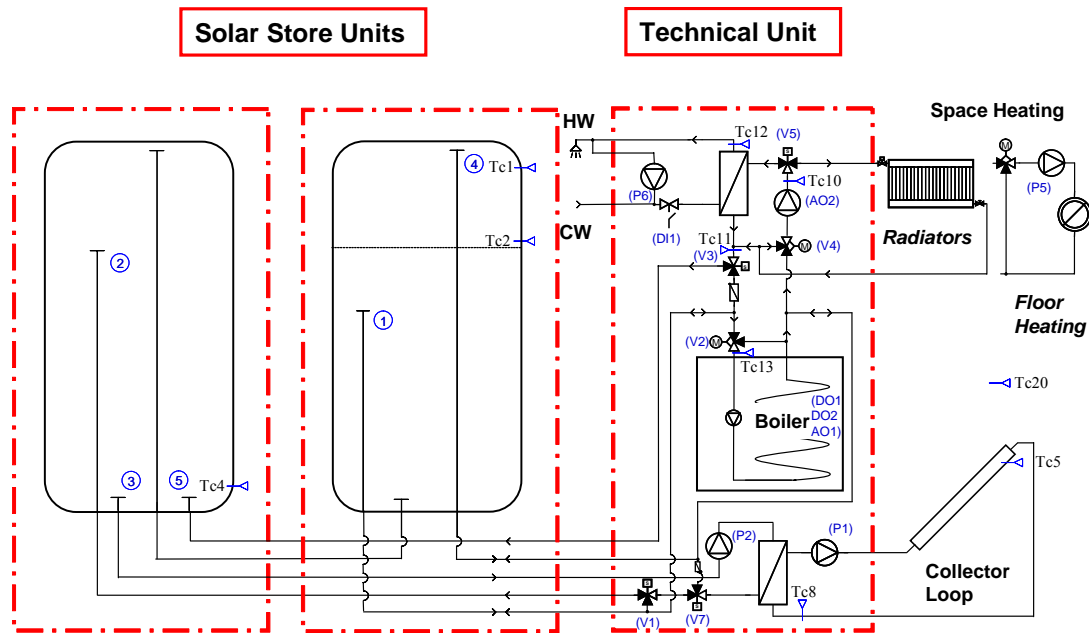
Principle hydraulic scheme of the solar combisystem concept with two tanks to be used with a fast natural gas boiler.
